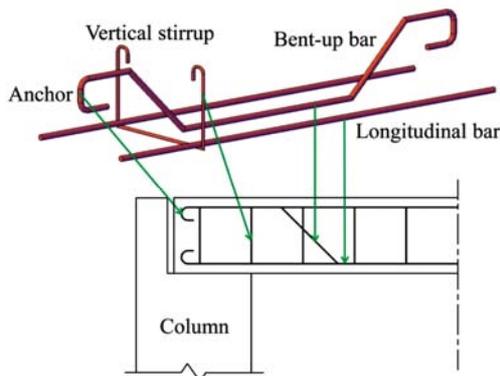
Typical arrangement details of the reinforcement bars in a simply supported beam
